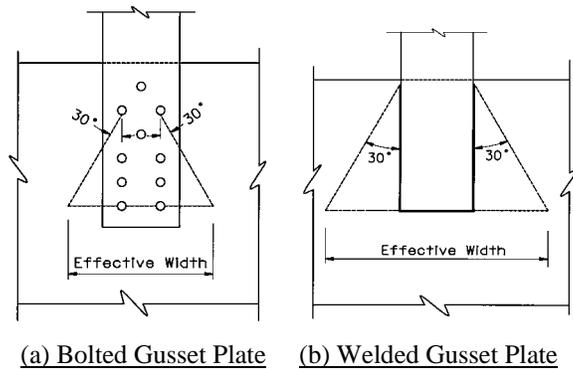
Effective Width of Gusset Plate
